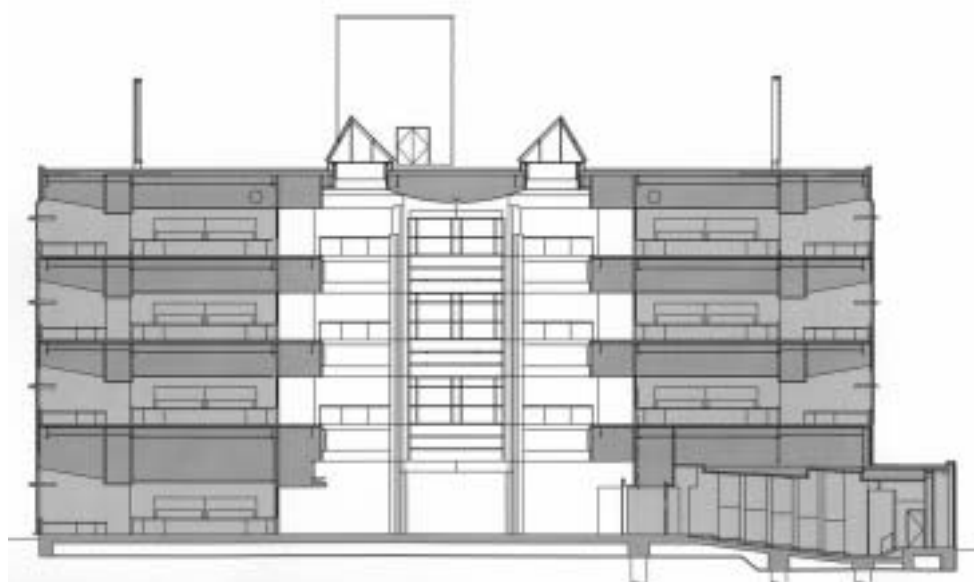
This building section shows the interior perimeter light shelves and the interior atria, which provide daylighting (Courtesy of Flad & Associates, Architect).
